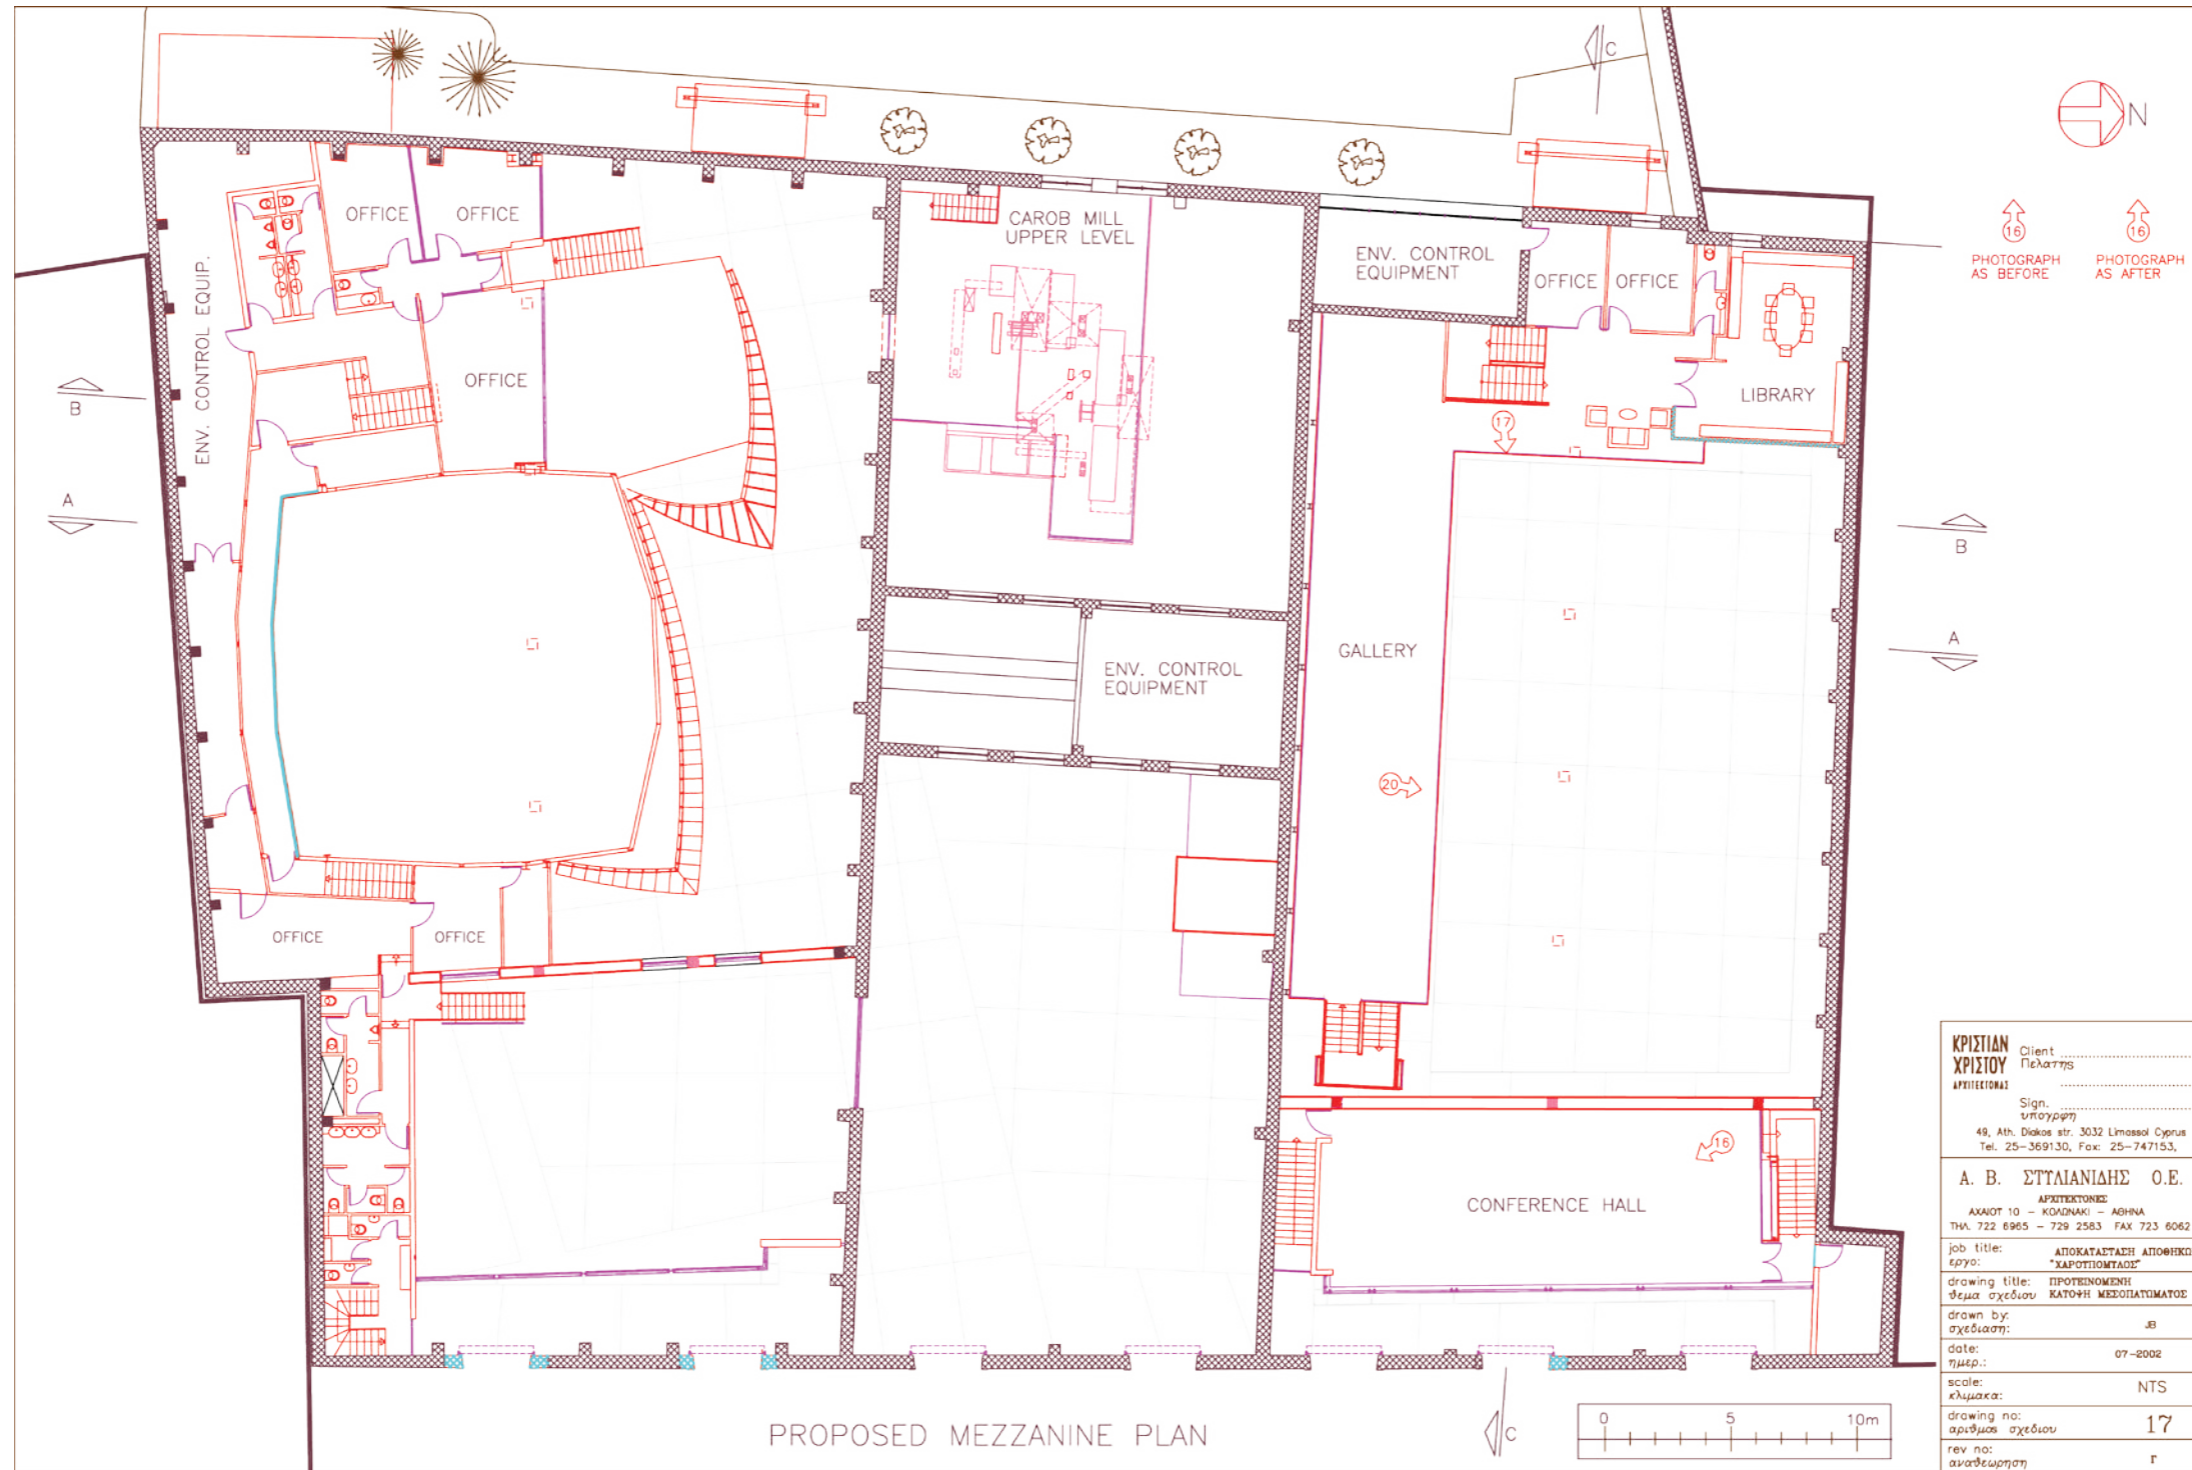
Mezzanine floorplan of the proposed intervention. © Kristian Christou Architects, A. J. Brooks, Architect.
